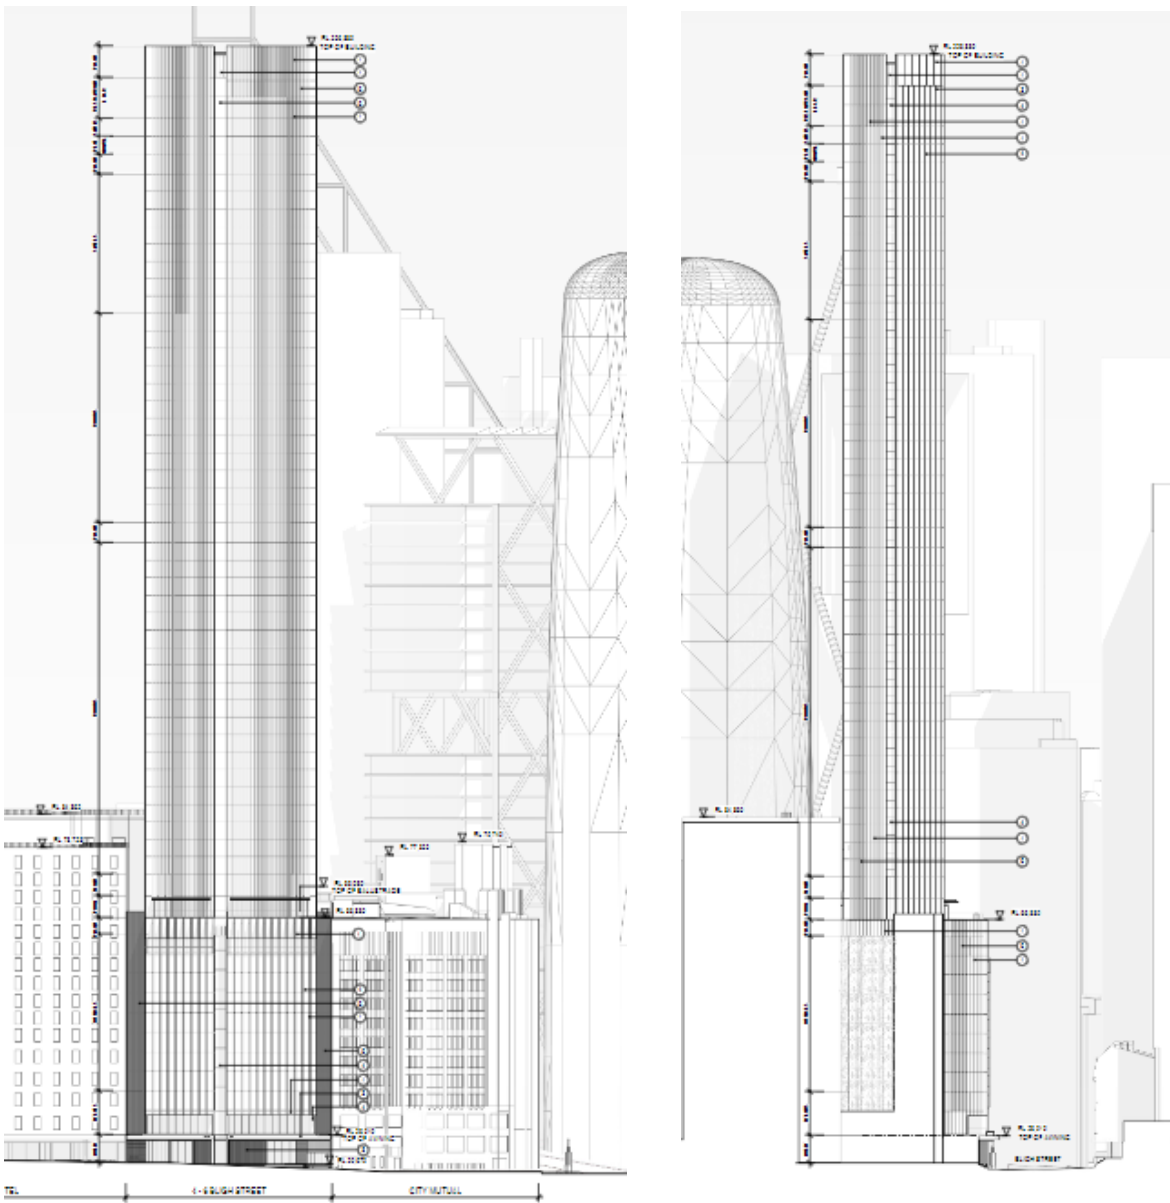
Extract of proposed plans: front elevation (left) and side elevation (right)
